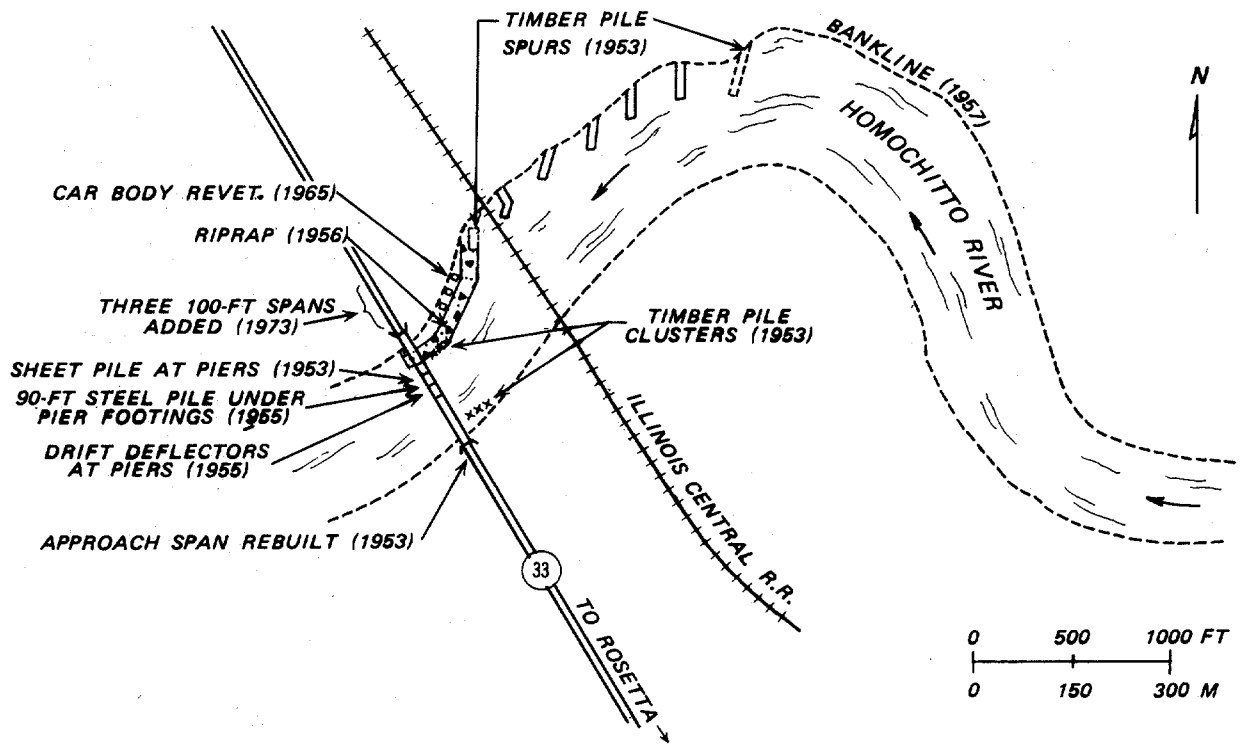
Plan sketch of Homochitto River, SR-33 crossing at Rosetta, showing placement of countermeasures.
